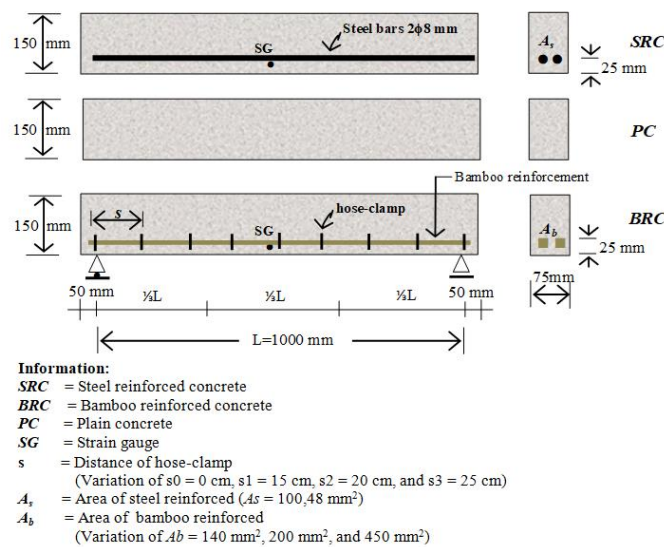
Geometry and details of bamboo-reinforced concrete beams.
